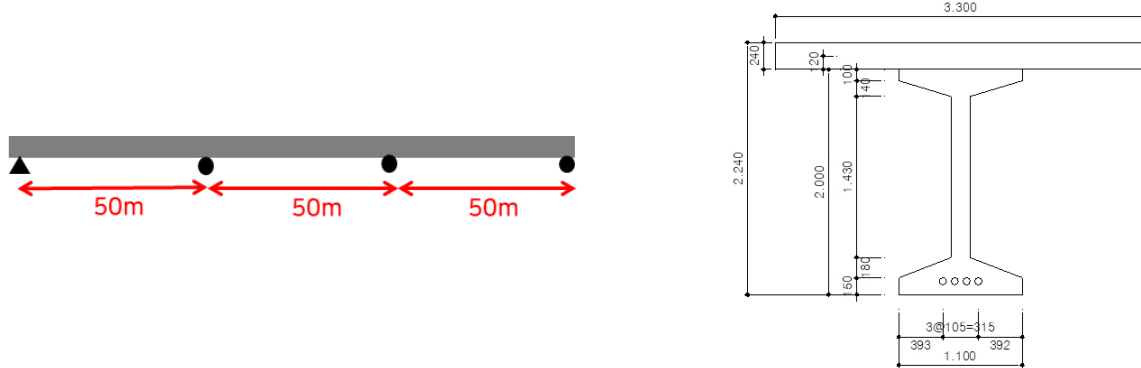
Three-span Continuous Prestressed Concrete Composite Girder Model Applied to Analysis
